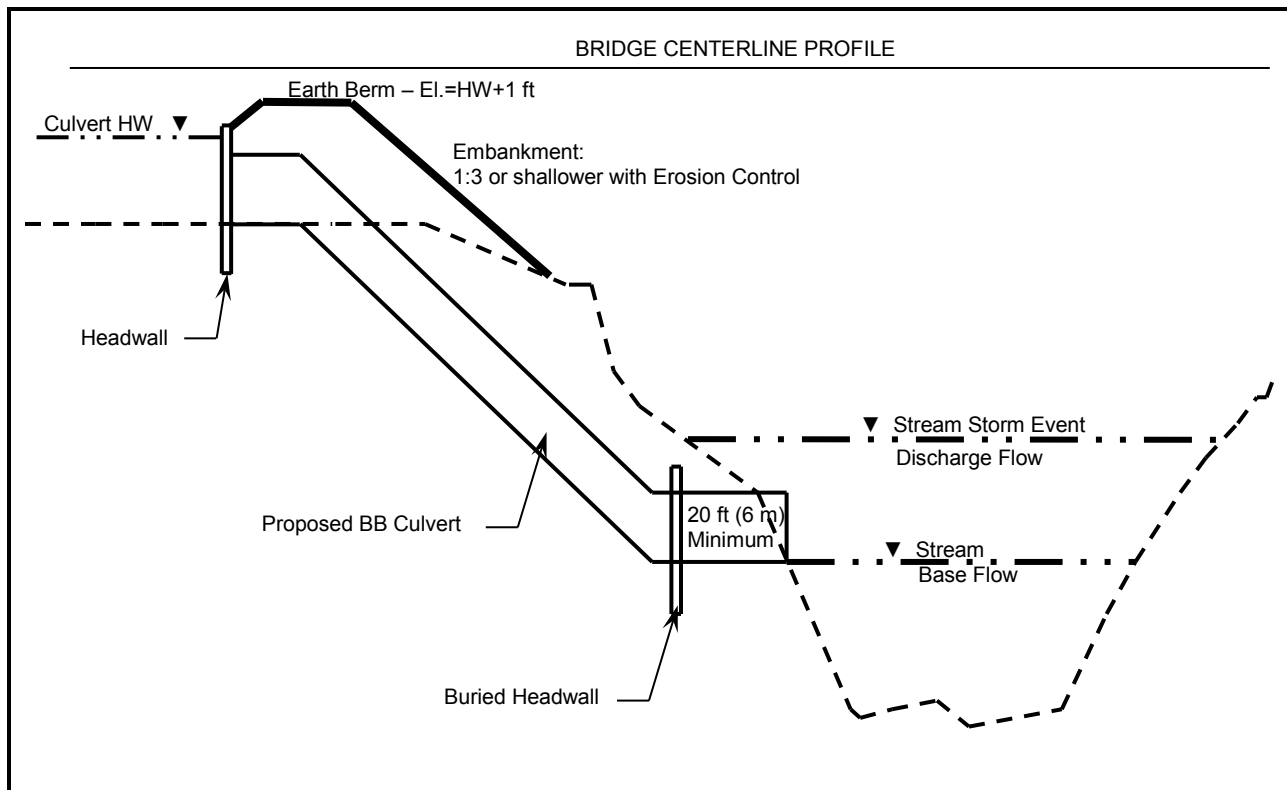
Typical Drop Pipe Design from Ditch to Stream
